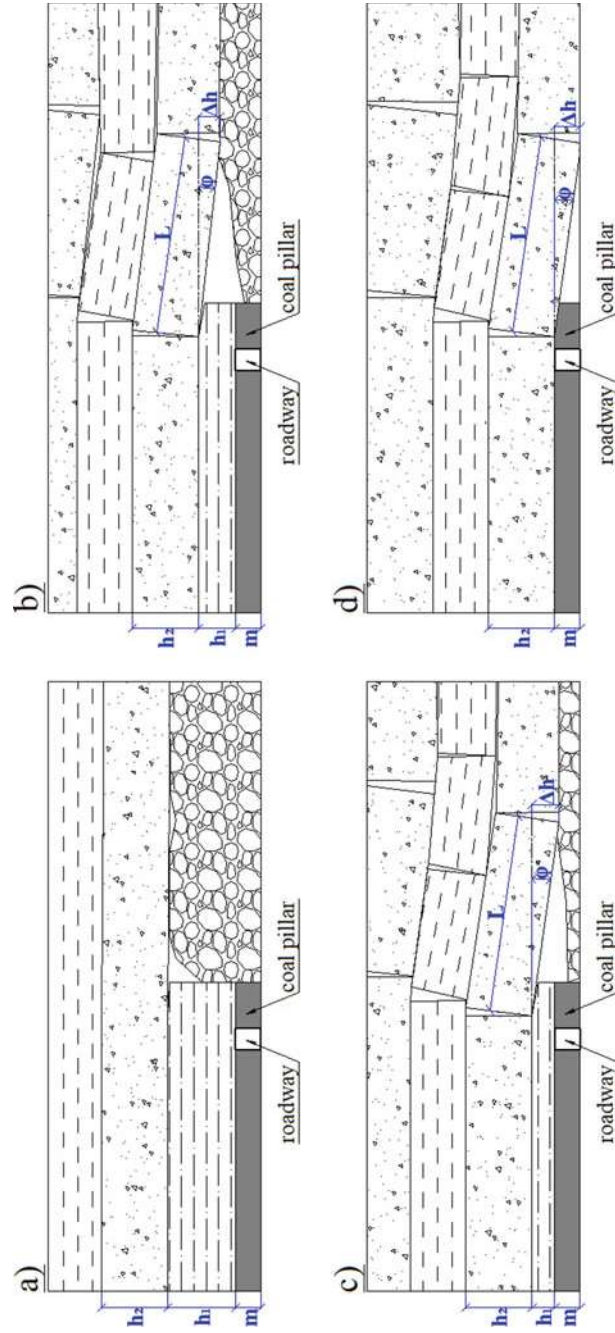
State of collapse of the main roof in various roof structures: a very thick immediate roof, b immediate roof of medium thickness, c thin immediate roof, d no immediate roof
